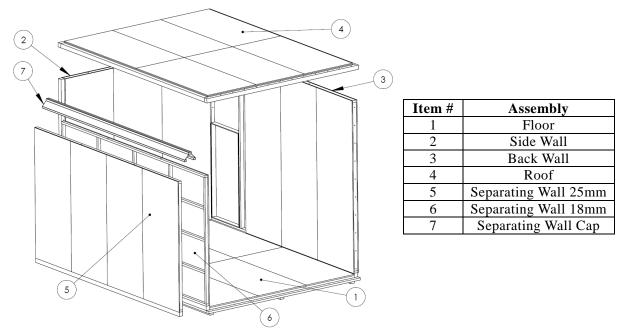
Exploded view of one of the two identical rooms to be constructed for the CAC test facility.
